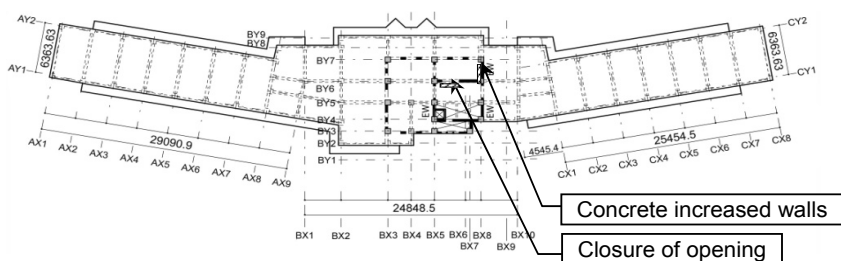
Seismic reinforcement location chart (3rd floor framing plan).
